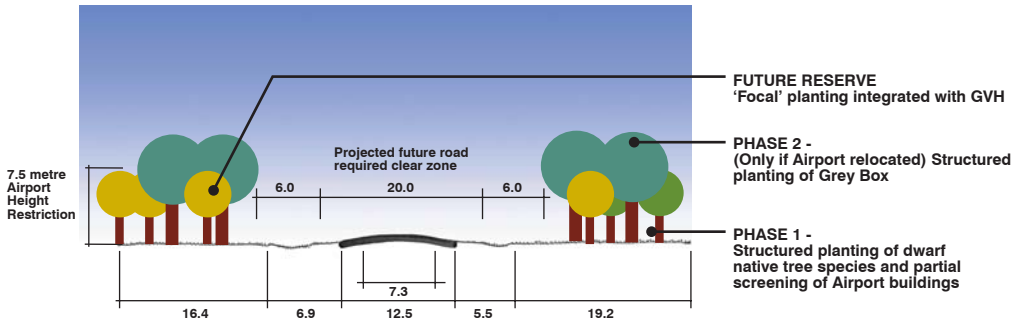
Typical Cross Sections (Note - Sections viewed looking north)
